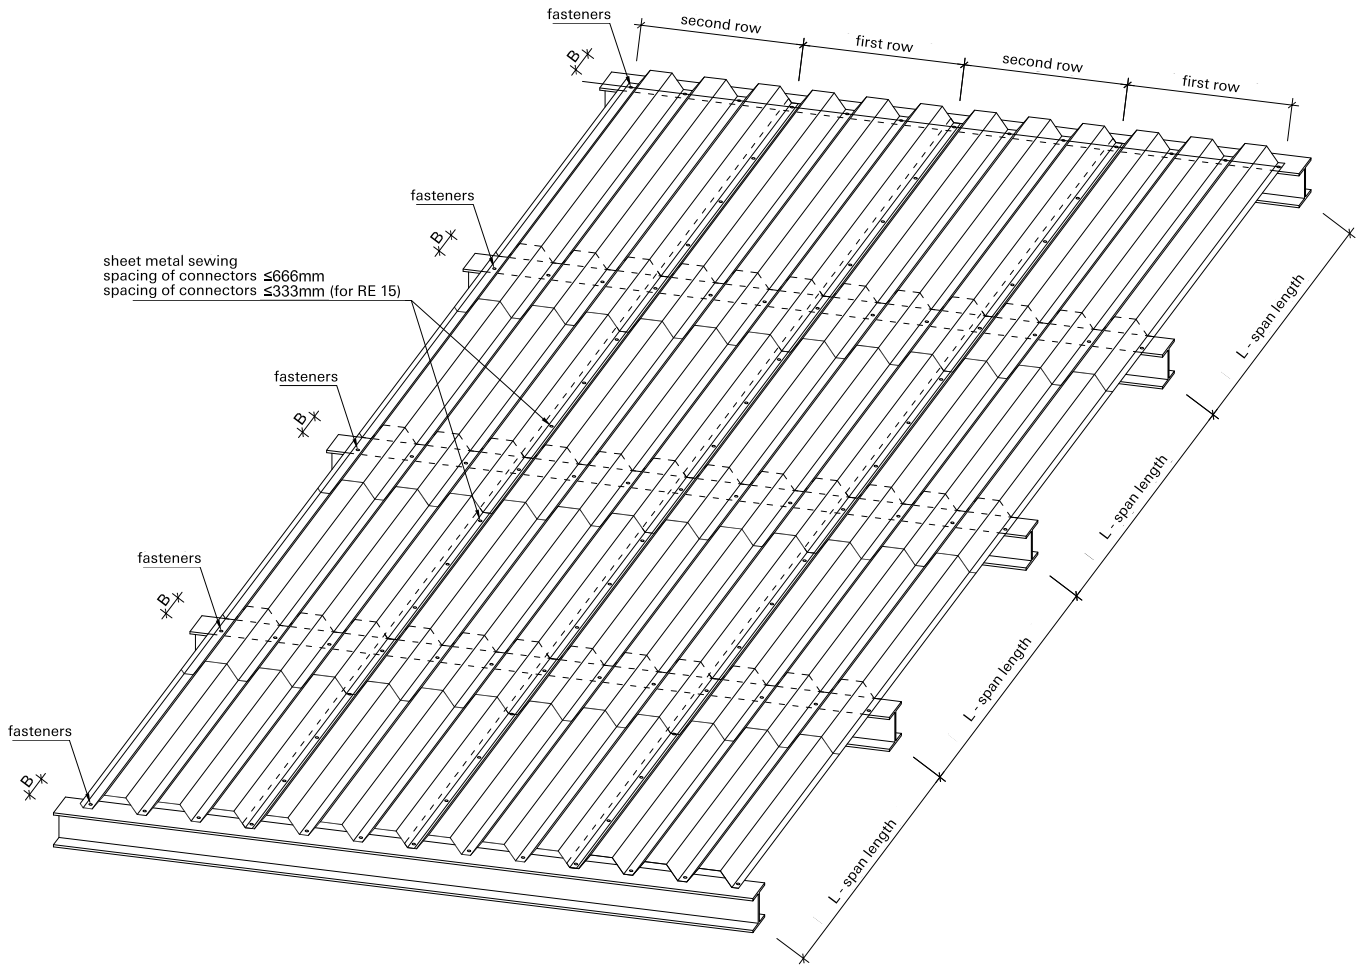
Installation of sheets with a single joint reinforcement over the intermediate support.
